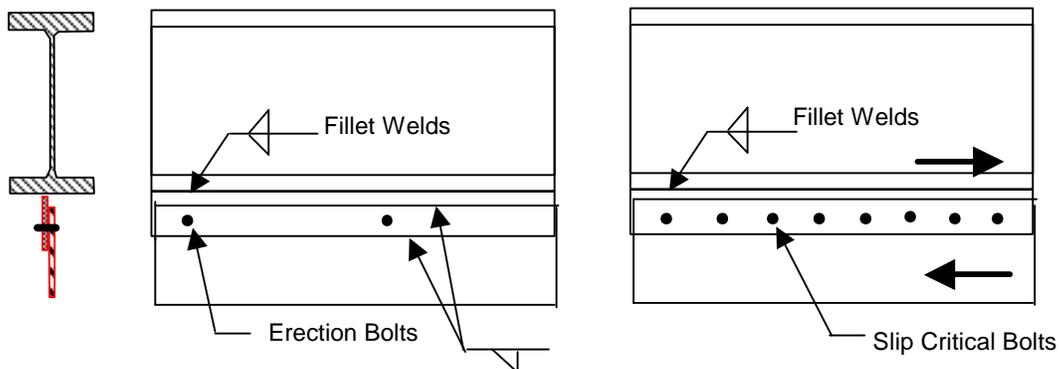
Connection of steel plate shear wall to boundary beams and columns
